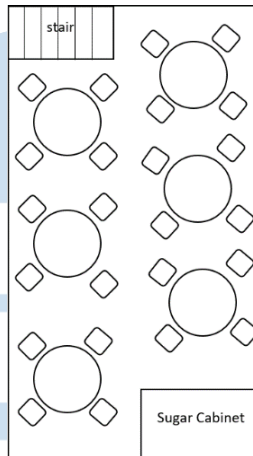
HYPNO TEA 2<sup>nd</sup> Floor Plan
